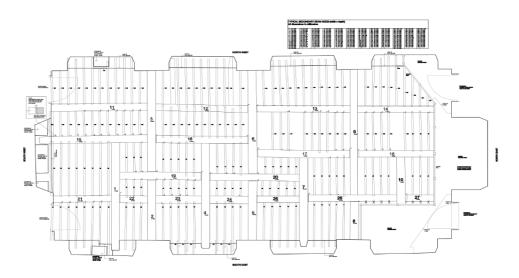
Survey plan of Prospect Room floor showing main beams marked 1-27 (The Morton Partnership Ltd.)
